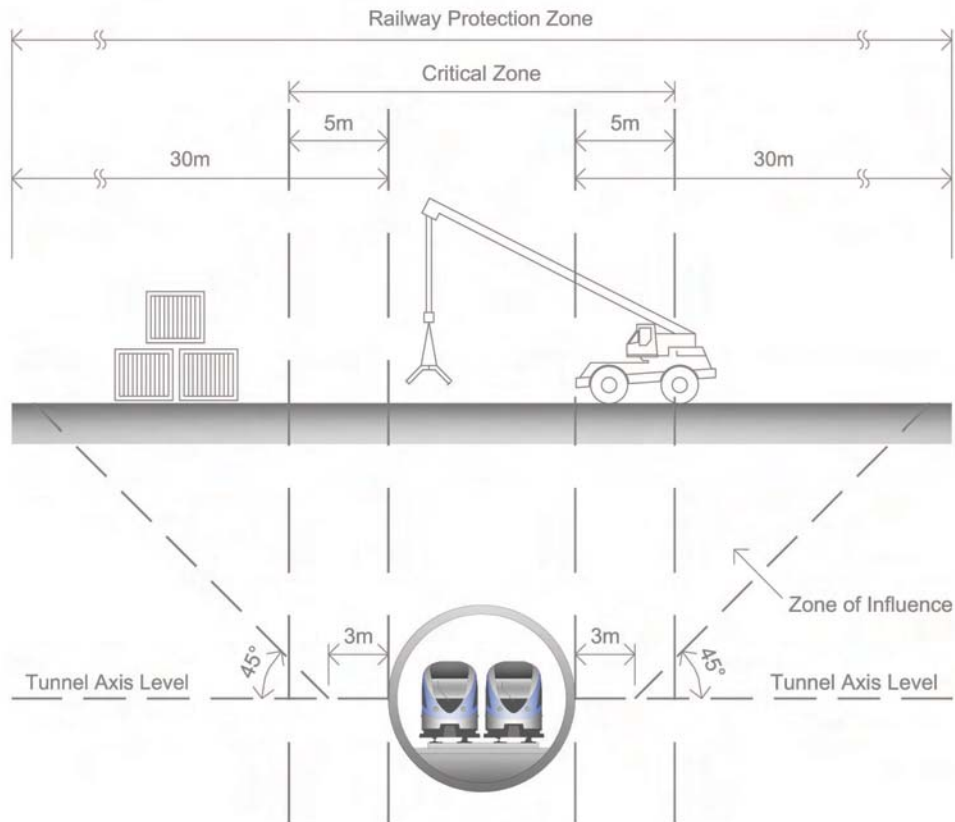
Loads imposed by placing or using heavy machinery or goods above Railway structures should be checked against the allowable limits
